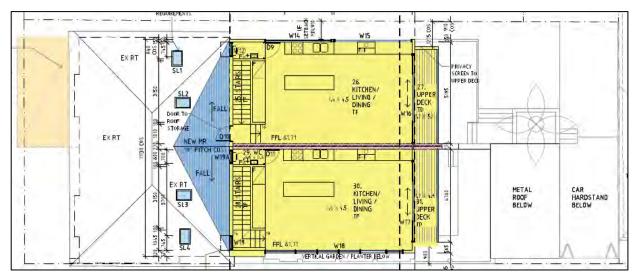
Proposed first floor plan under DA-114/2021/1 (Source: Edifice Design, 2021)
